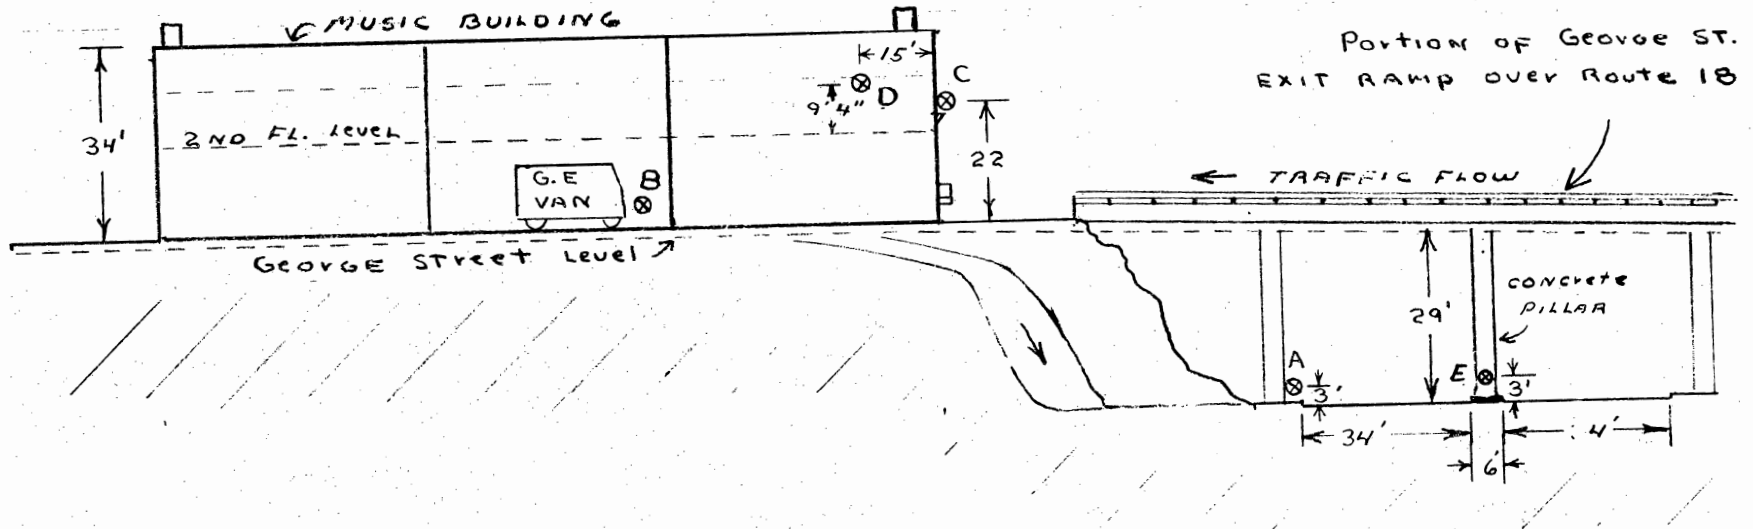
MUSIC BUILDING—ELEVATION VIEW
